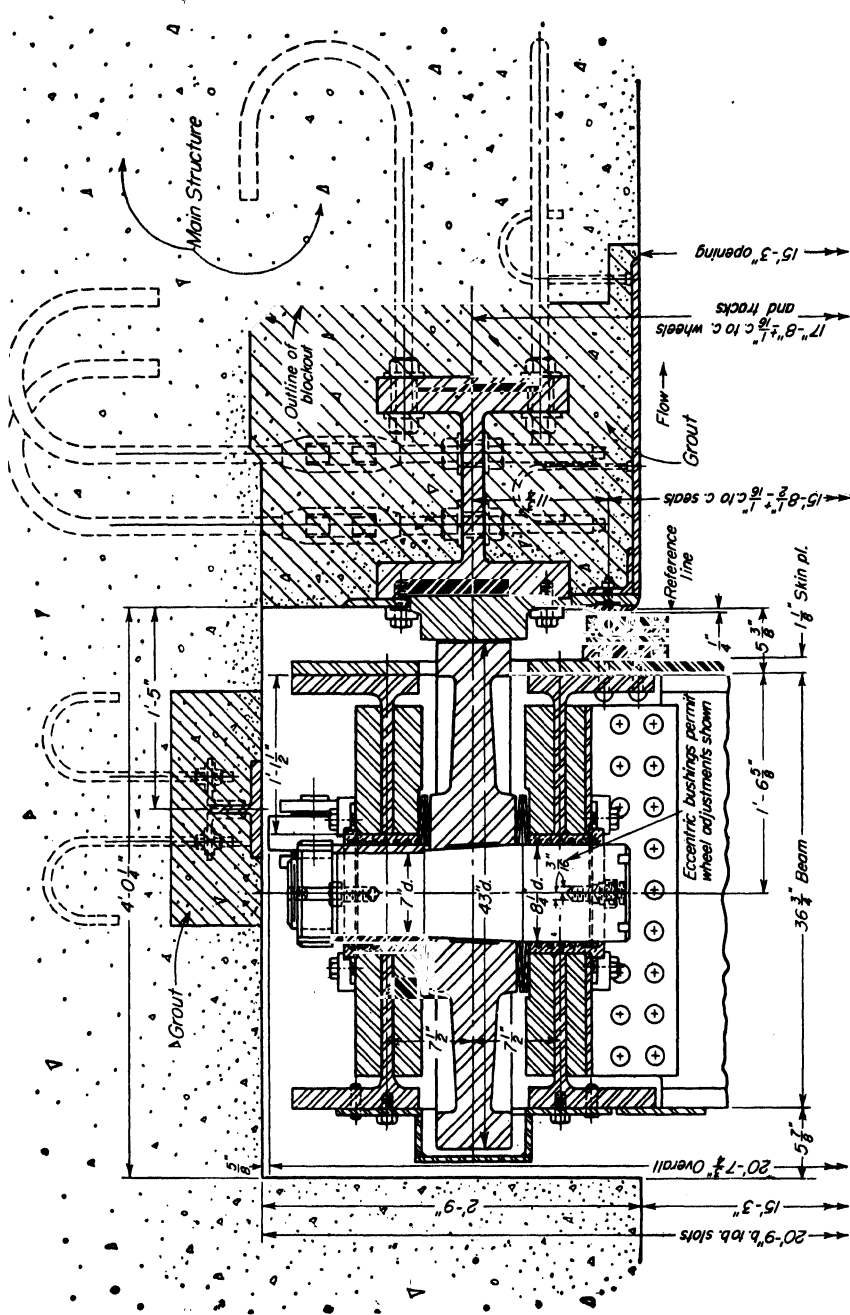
Fixed-wheel gate. Slot section assembly showing gate in place on track and frame sections that have been grouted into blockouts formed in the main structure after they have been accurately aligned and held in position by the anchor bolts previously embedded in the main structure concrete. (Courtesy of Bureau of Reclamation.)
